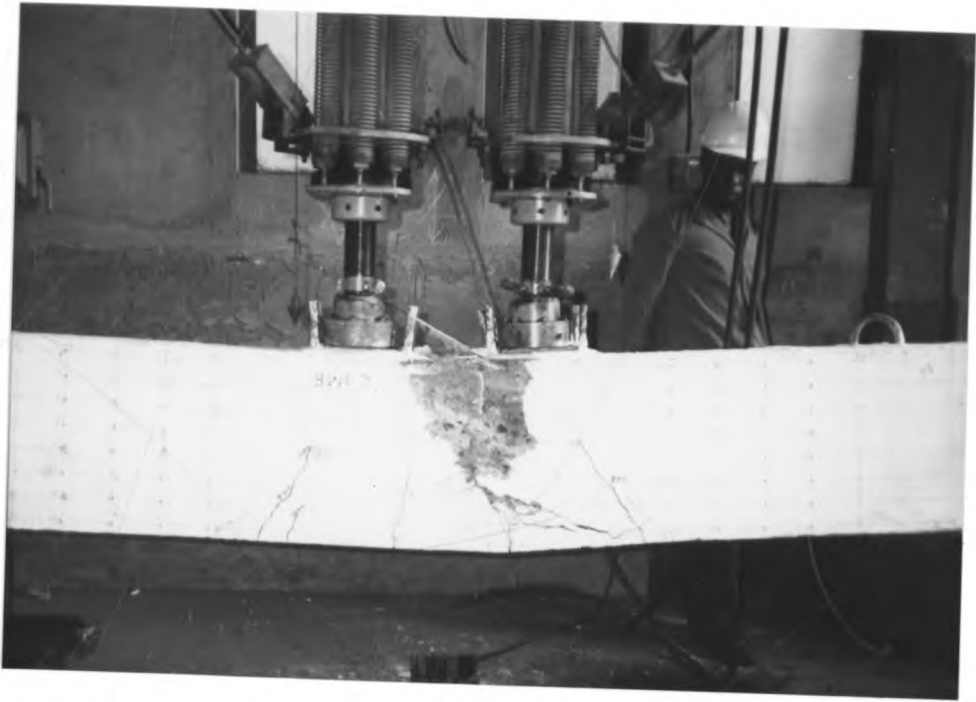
CRACK PATTERN IN BEAM BWR-2
